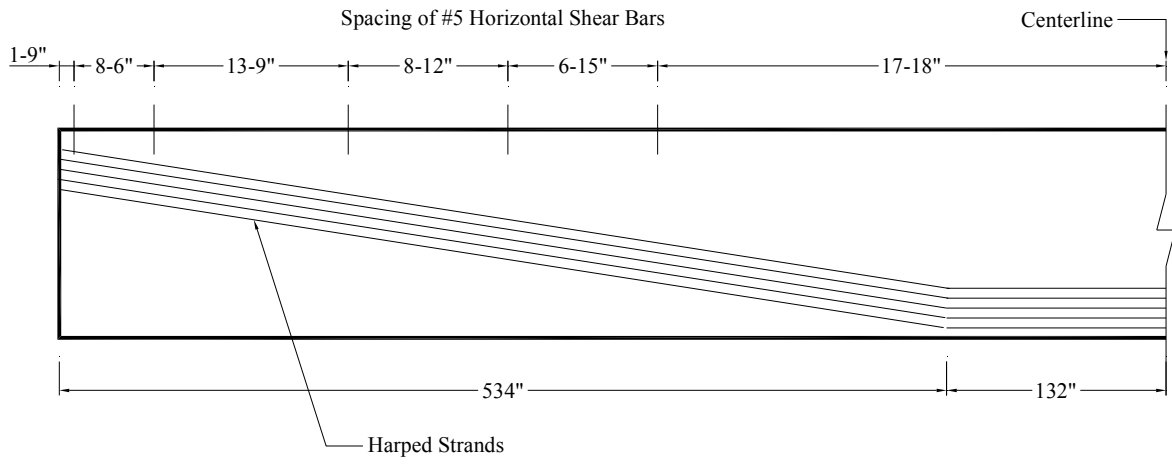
Elevation of Wapello County UHPC bridge beams.
